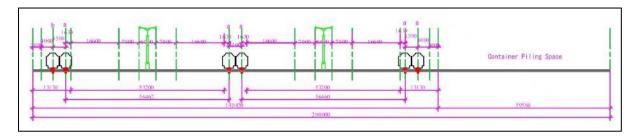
Lamu RFT - Cross Section A-A – Bulk Cargo Loading / Unloading Facilities (JPC study)
